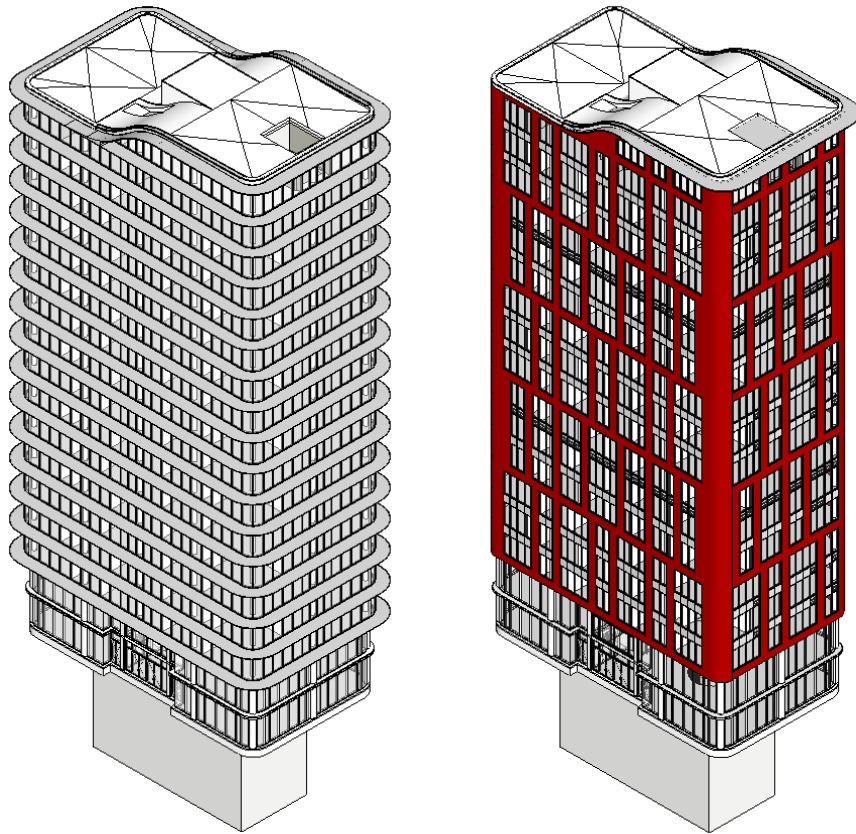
Flahouse project with 2 variants of façade (author´s archive).
